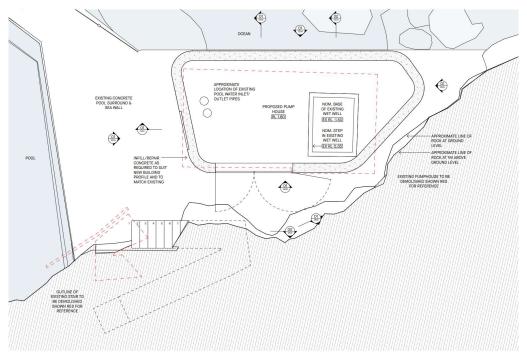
Floor plan of the pumphouse, shown against the location of the existing building (dashed red). Source: Panov-Scott.
